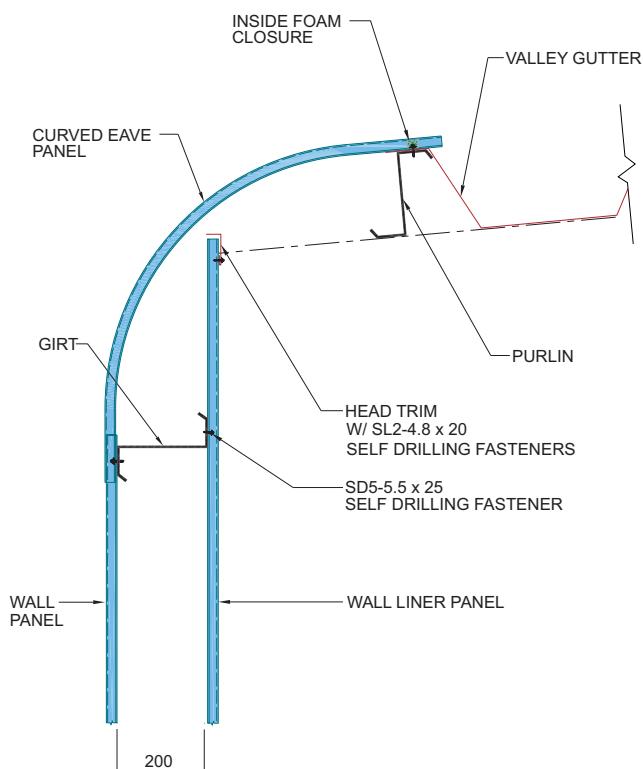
DETAIL : ROOF/WALL LINER AT EXPANSION JOINT
